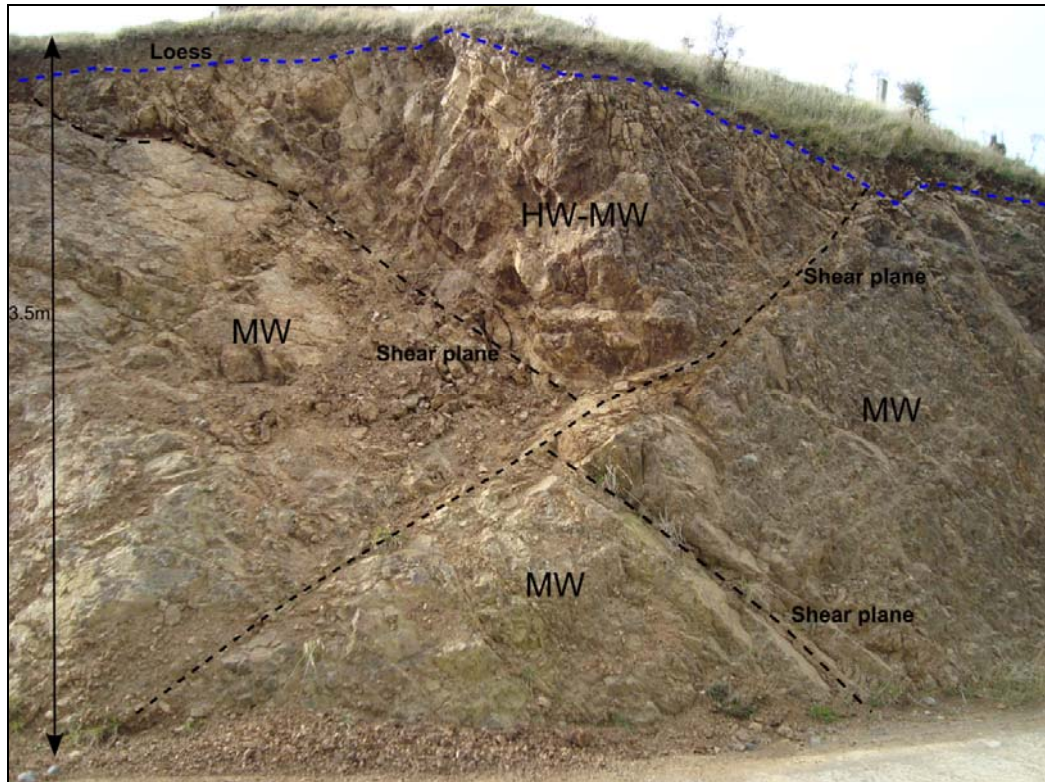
Face log from a road cut along North Range Road on the Te Rere Hau Windfarm. Location E 2741923, N 6086120, elevation 472m (WGS 1984).
